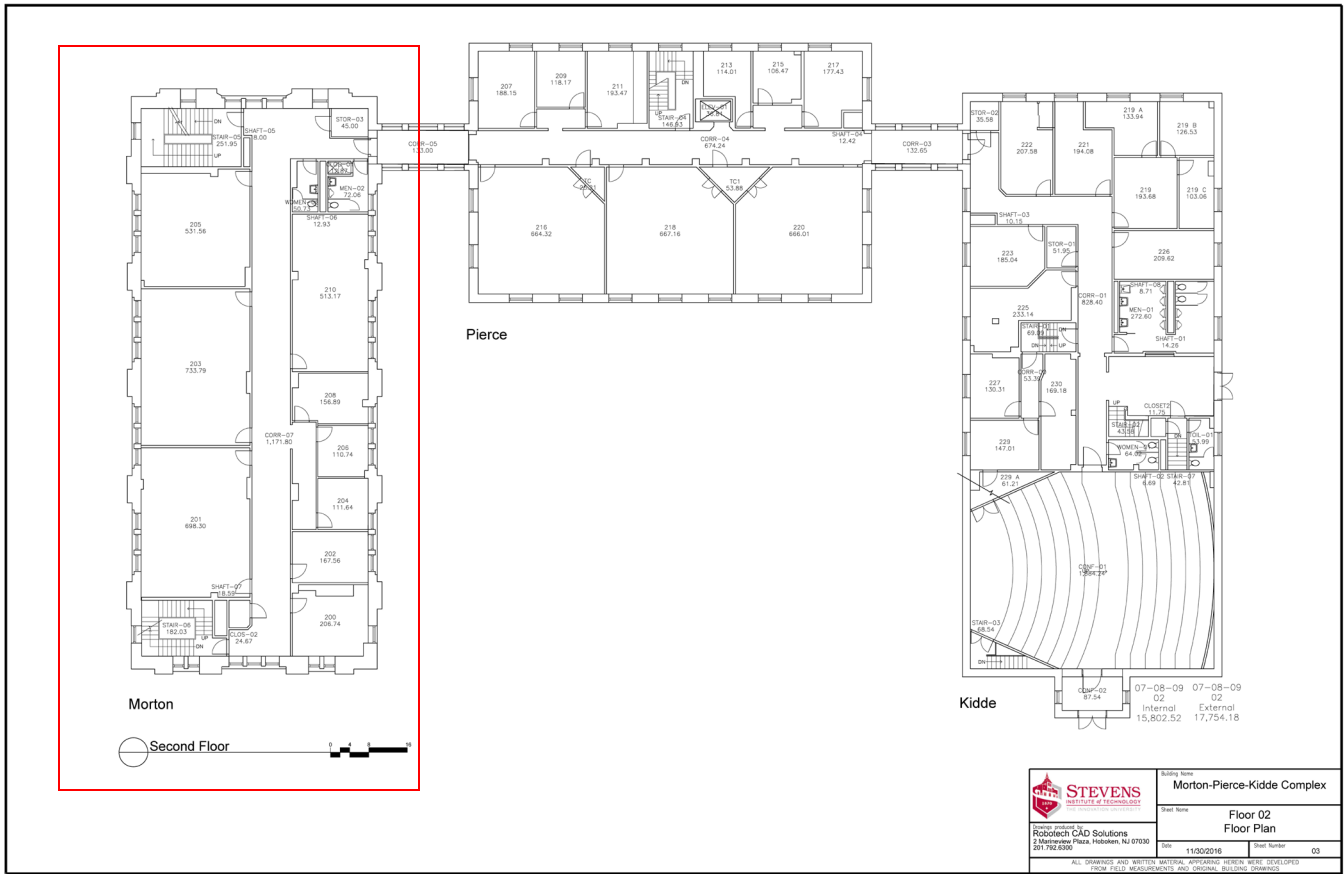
Morton Memorial Laboratory of Chemistry, Second Floor Plan, outlined in red (2016).
